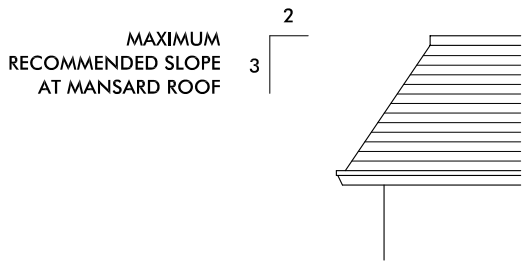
A.3.D.I. MAXIMUM MANSARD ROOF SLOPE
